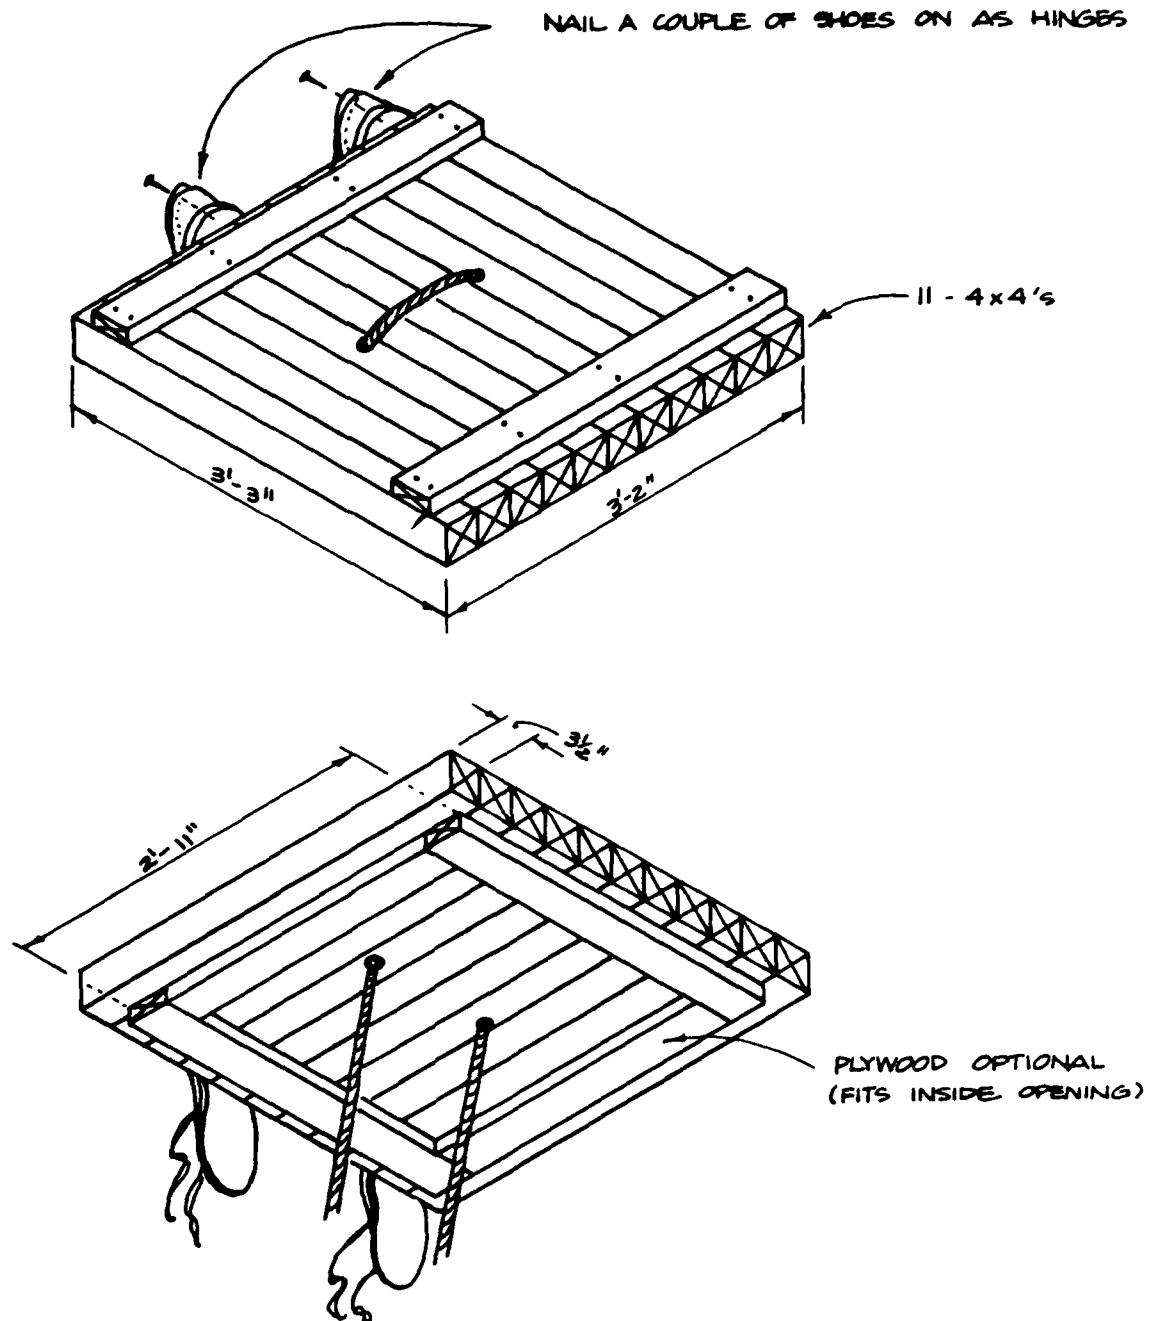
Closure for 40 psi Entrance Structure to Key Worker Shelter (Wood Construction).
